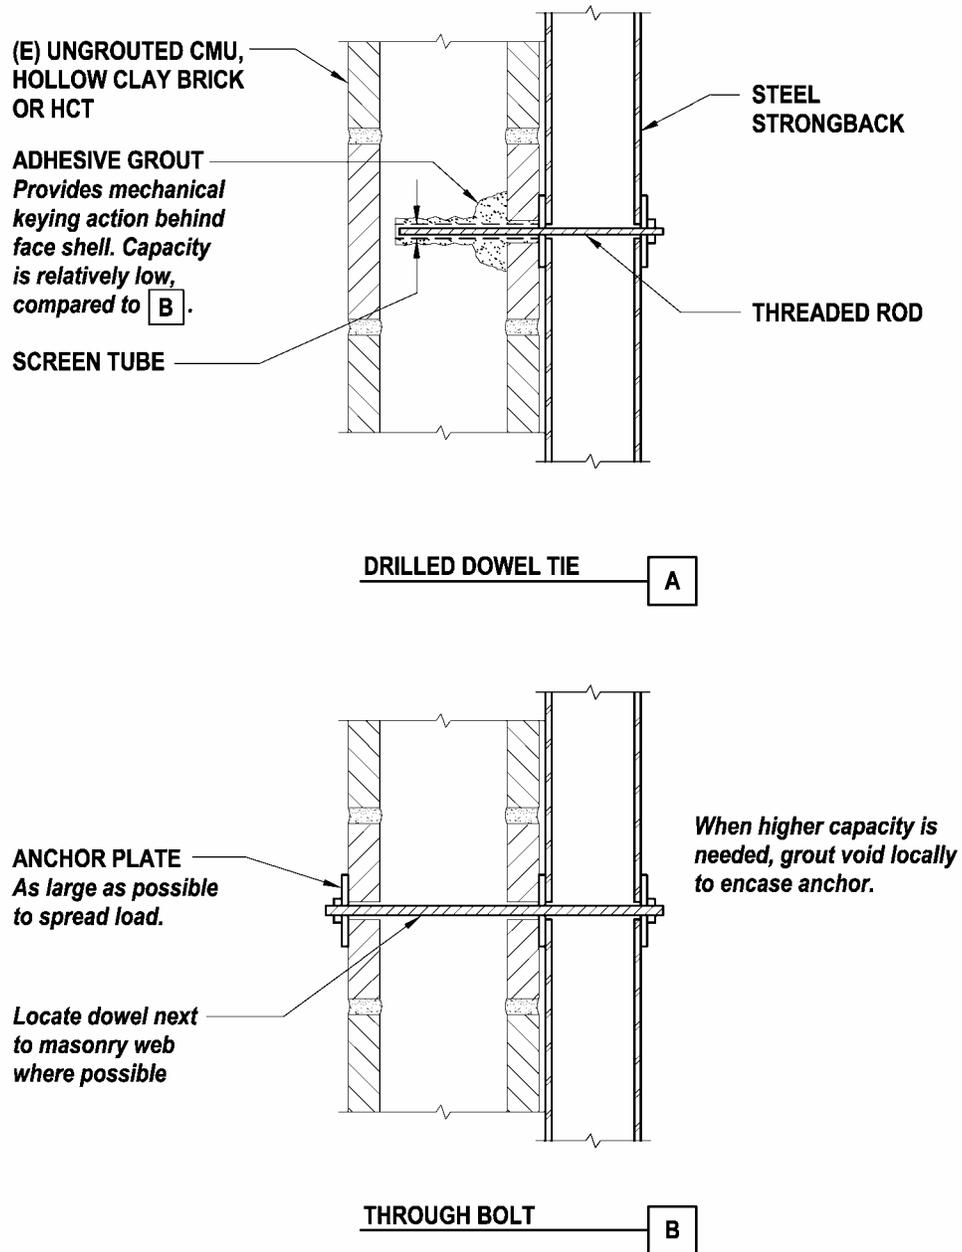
Connection of Strongback to Hollow Masonry
